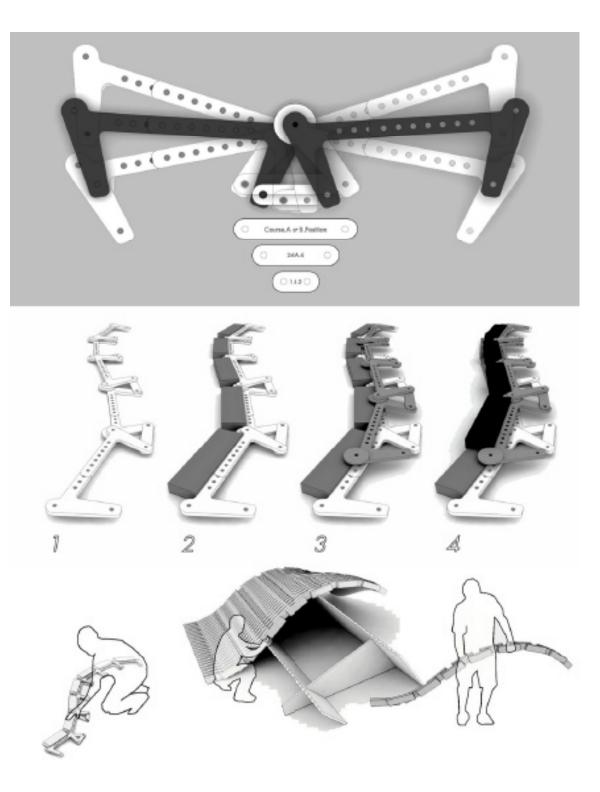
TOP: Diagram of the Jig shown in various positions. MIDDLE: Assembly of courses using adjustable jigs. 1. Bottom course jig is set with keys. 2. Wood blocks are set. 3. Upper course jig is placed and keys are set. 4. Upper layer blocks are glued and pneumatically nailed to bottom blocks. BOTTOM: Final shell assembly -courses are formed in jigs on left, and arranged on rail armature on the right. (images: Rob Corser and Scott Crawford)
